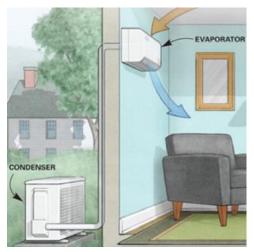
A typical mini-split ductless heat pump installation, shown with one evaporator.
